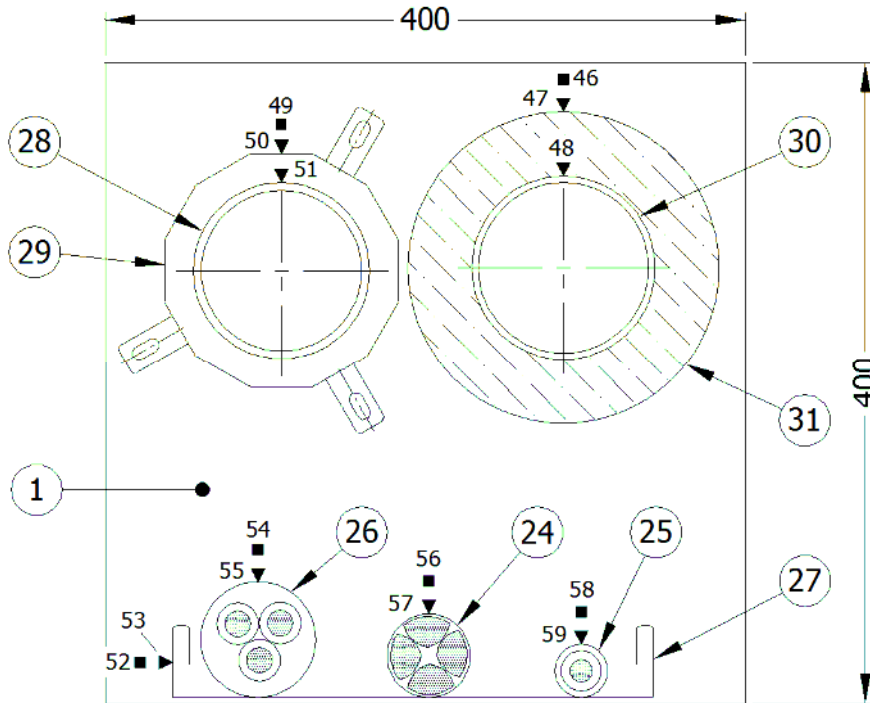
Wall Service E (Item 28 and 29 not within scope of certificate) - Section view
